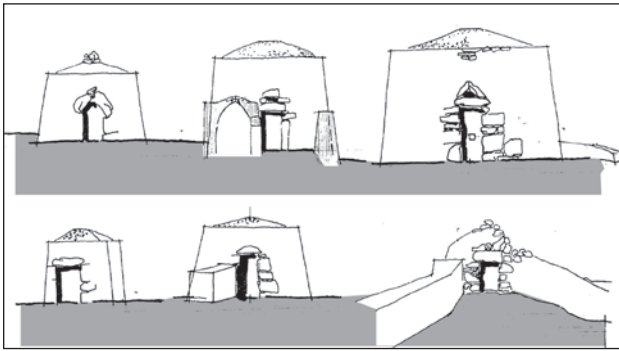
Several objects have several shapes of groundplans and elevations. The last has a smaller entrance, devoted to livestock.
